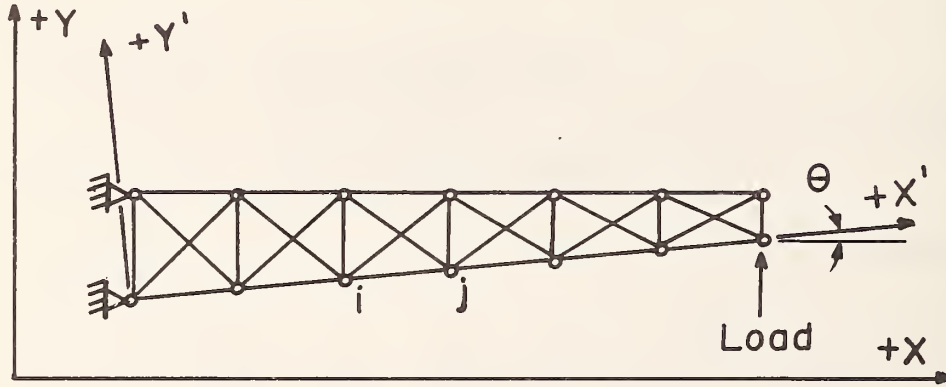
PRISMATIC TRUSS ELEMENT.
